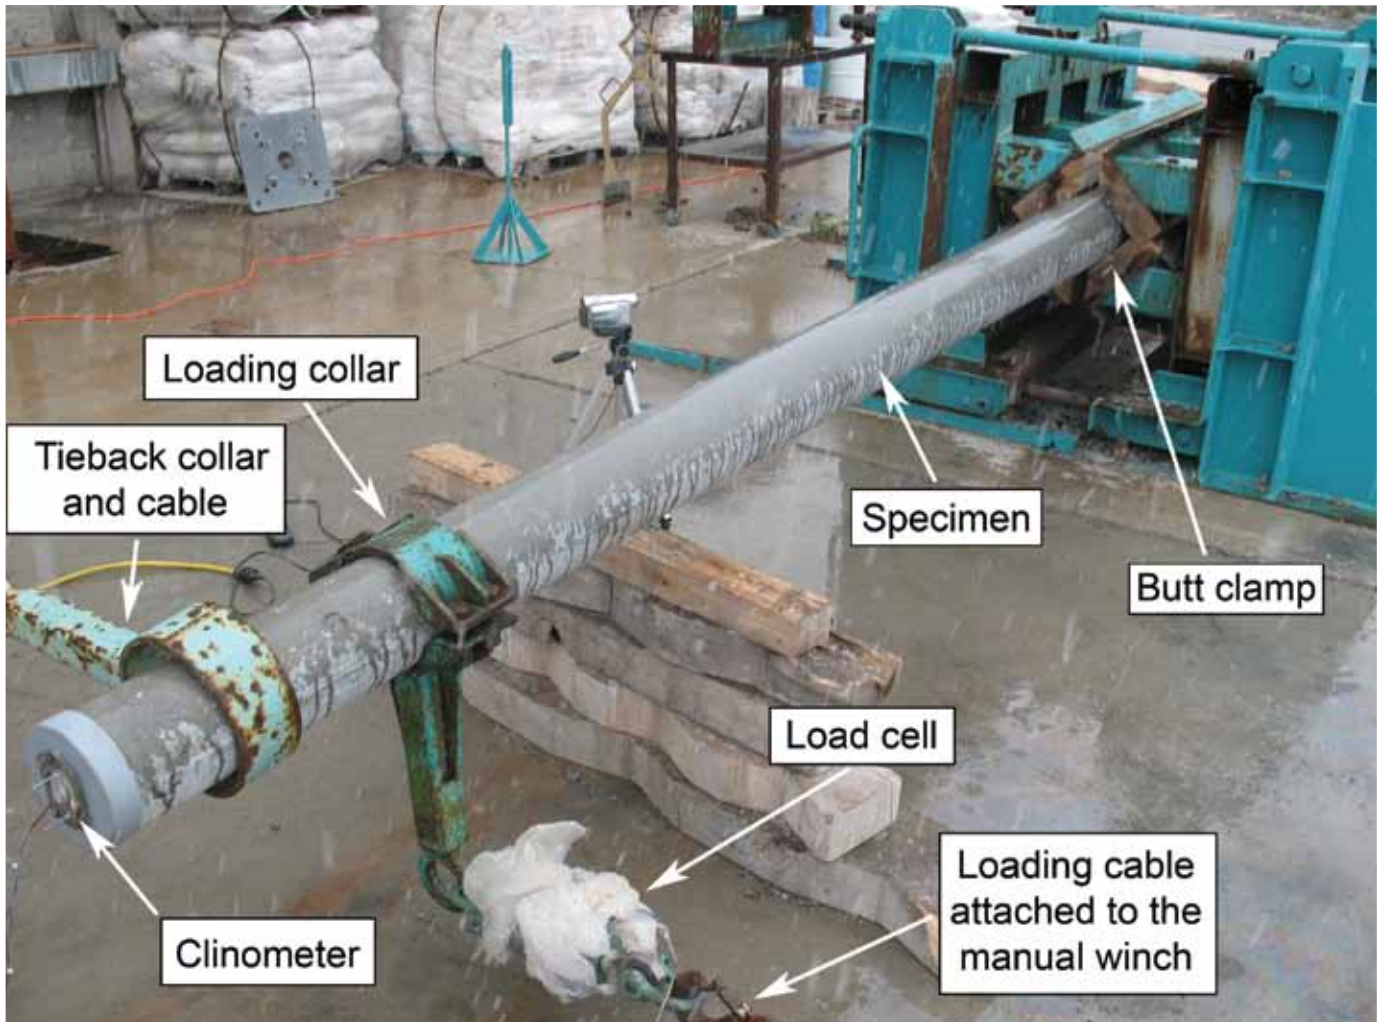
Loaded test setup with unreinforced 165 mm (6.50 in.) tip control specimen P-2 (165-C-2).
